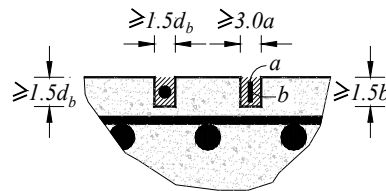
Minimum Groove Dimensions for Circular and Rectangular Bars
